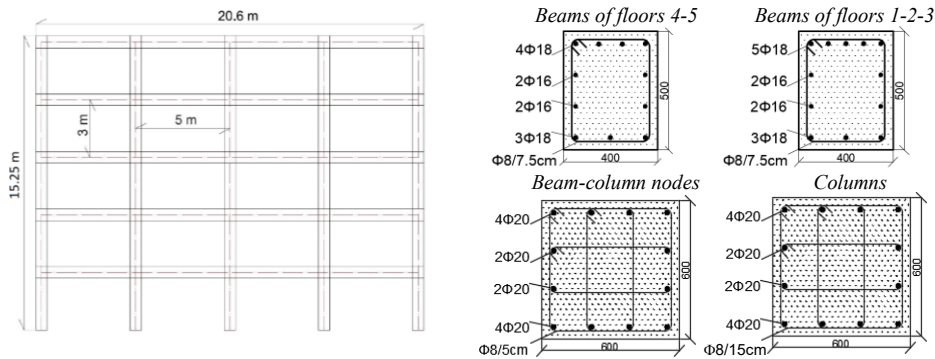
Characteristics of the frame under investigation: front view (left), reinforcement detailing of the structural elements in the most stressed sections (right).
